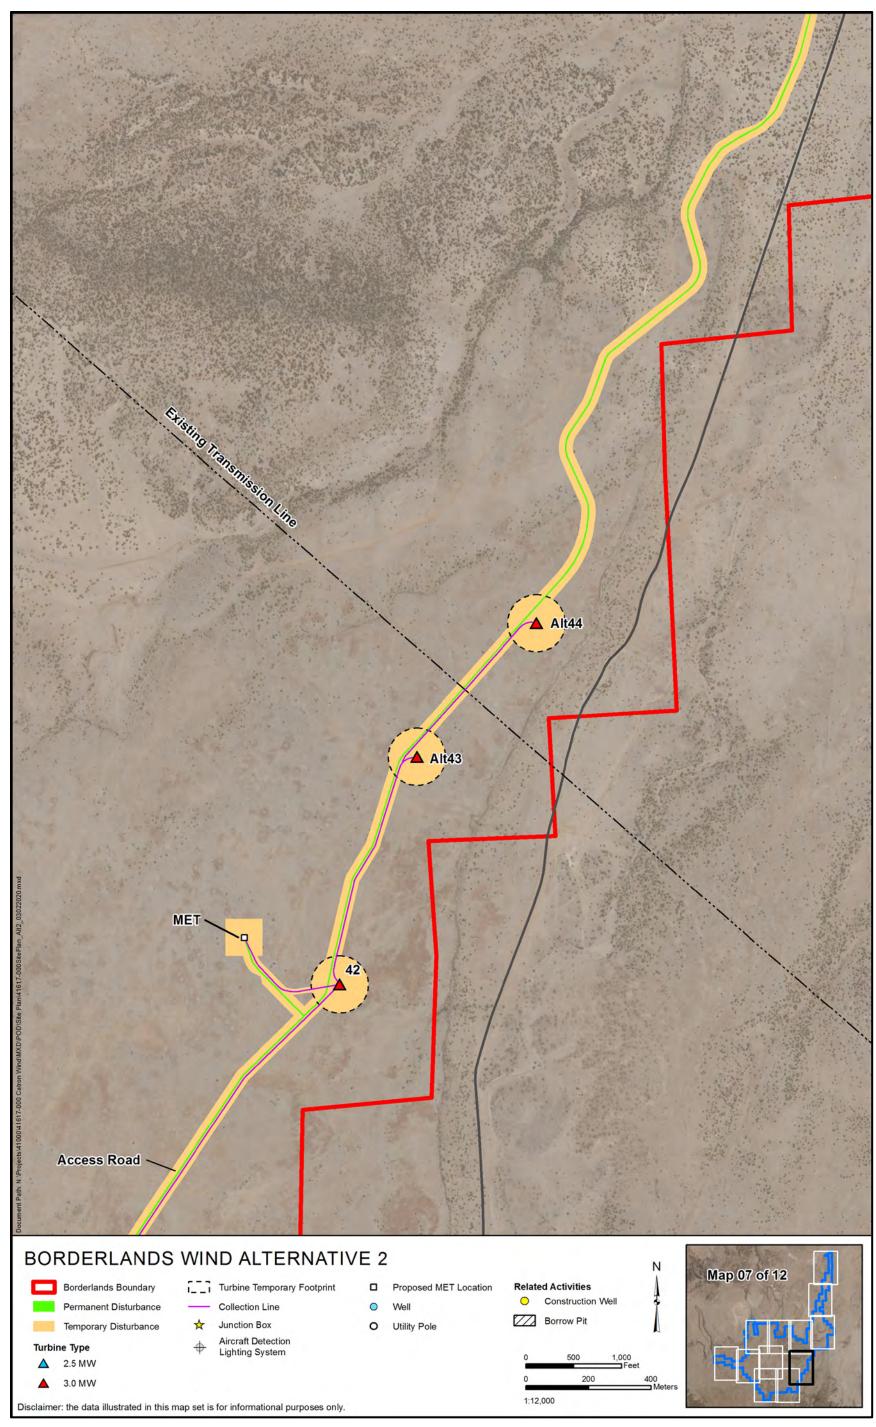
Alternative 2 Site Plan (Map 7 of 12)
